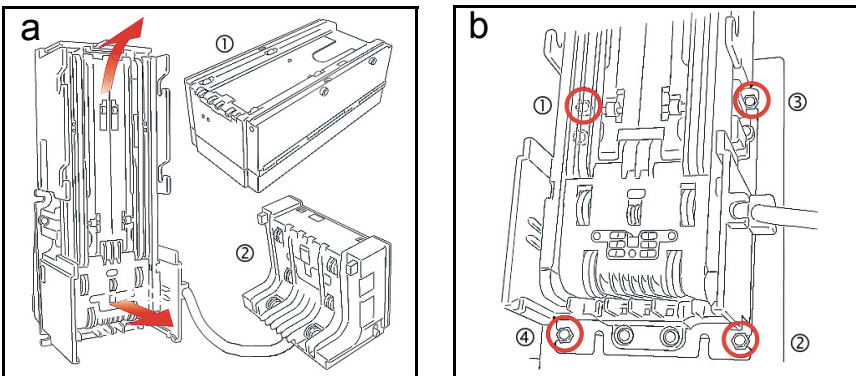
Cash Box Removal & Mounting Nut Tightening Diagrams
